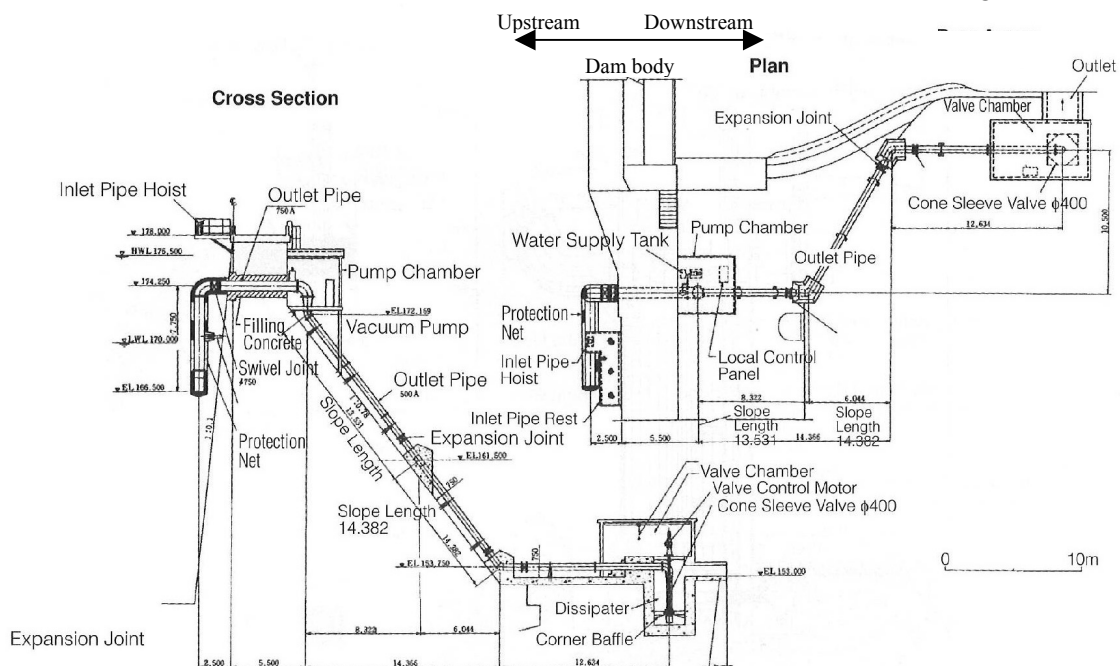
Plan and cross section of outlet at Kakkomi Dam
